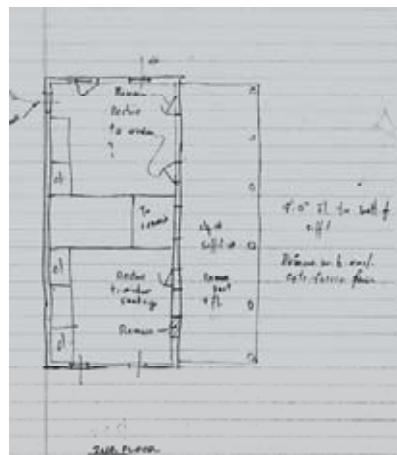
Sketch of second floor plan showing details by H. A. DeCosta Company. Courtesy of ARC, H. A. DeCosta, Jr. Papers, Box 38.
